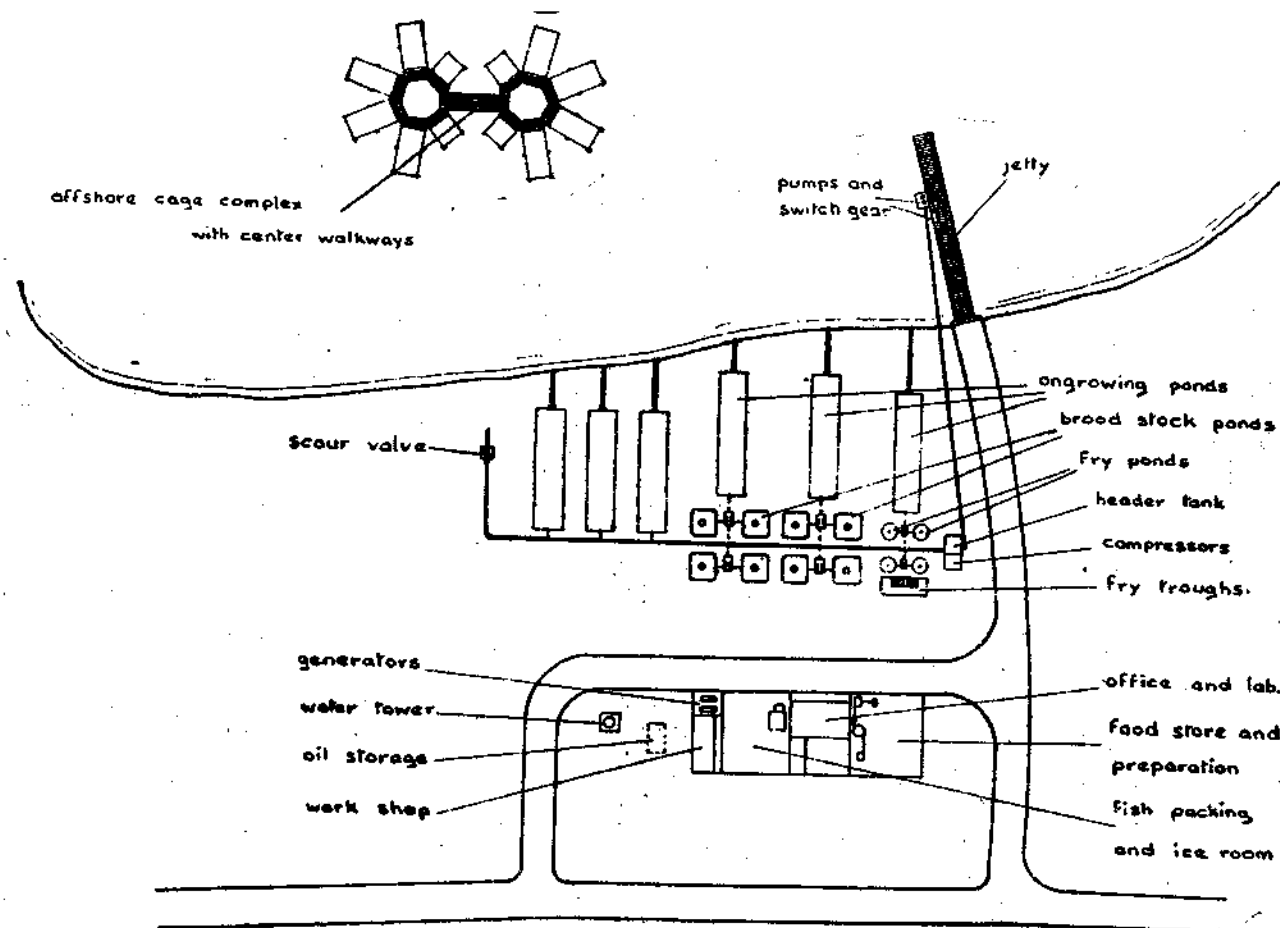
Layout plan of B.P. developments : Tilapiafarm at Bapo,
